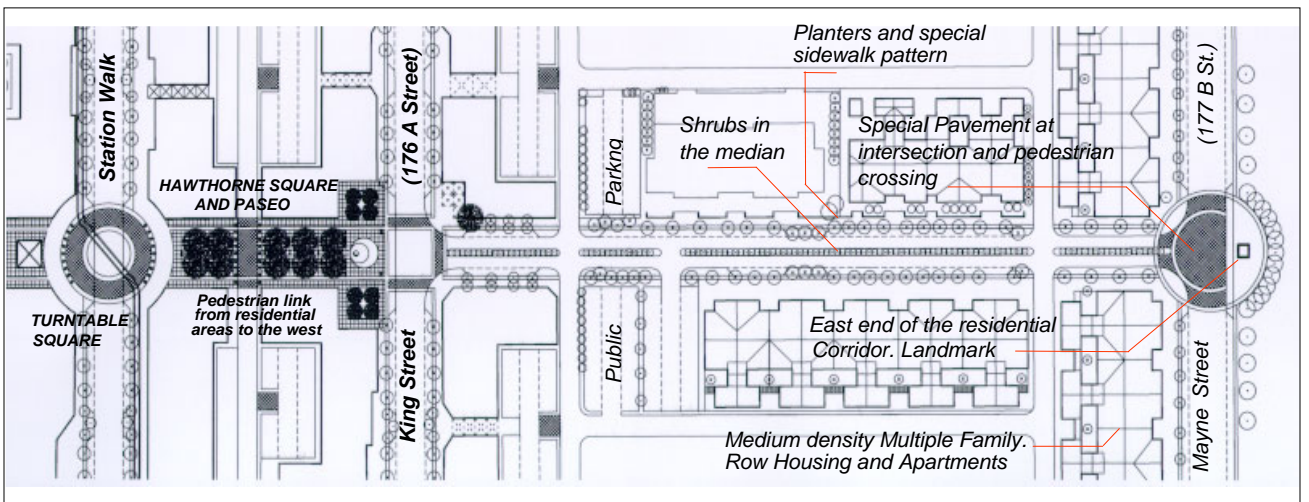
The Village Walk Residential Corridor (57 A Avenue)
